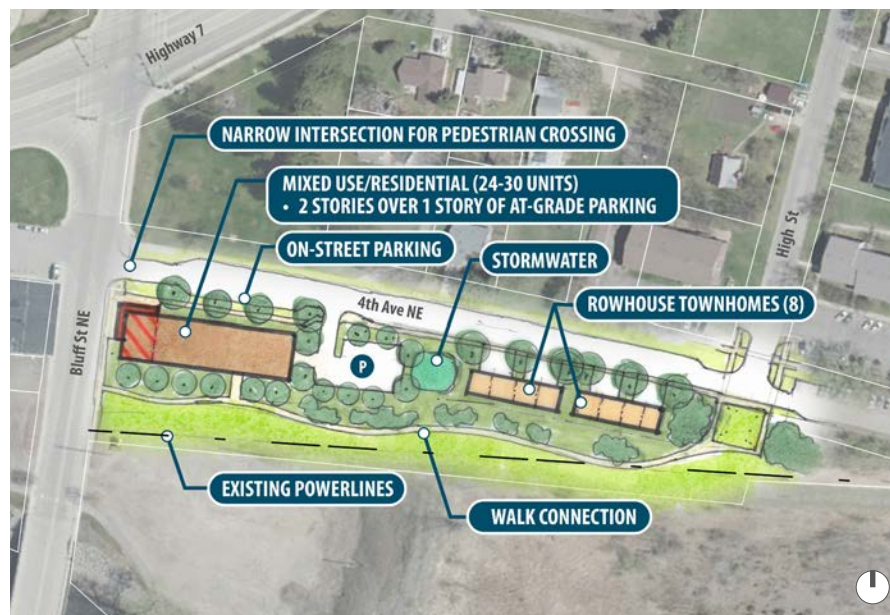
Bluff Street and NE 4th Avenue Concept Plan
